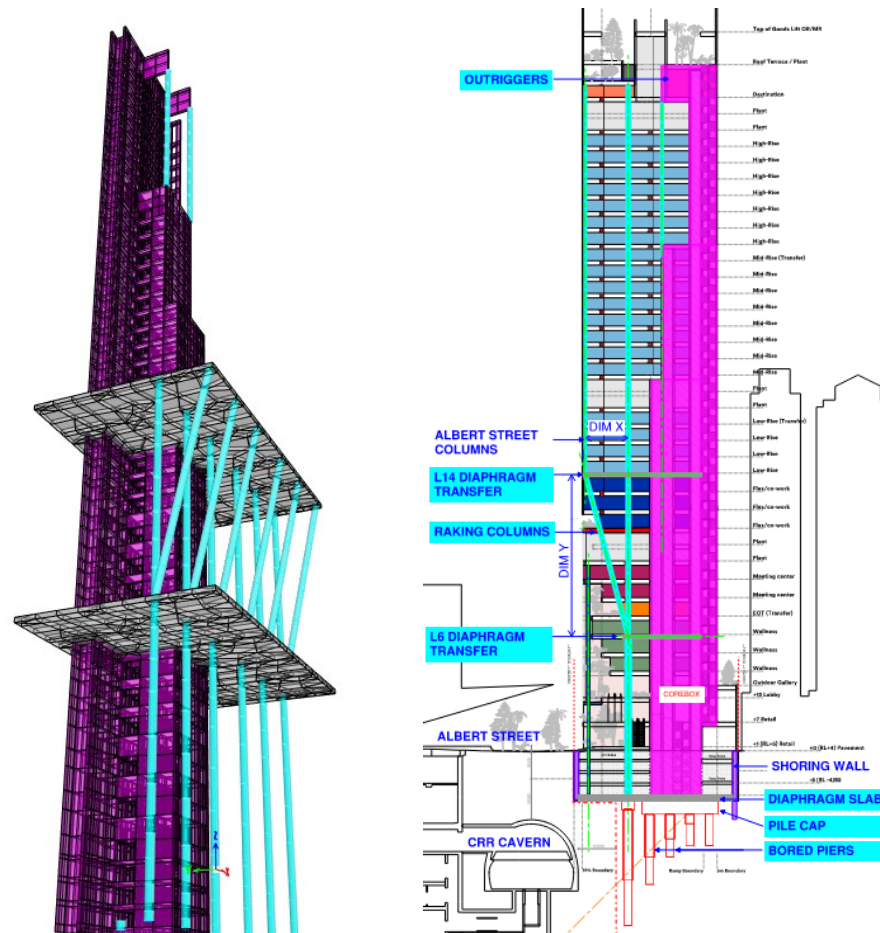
i) & ii) - 3D View and Section of the Lateral Stability System
